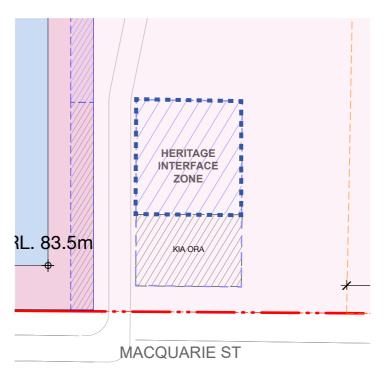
Envelope Plan with impacted area outlined in Blue.
